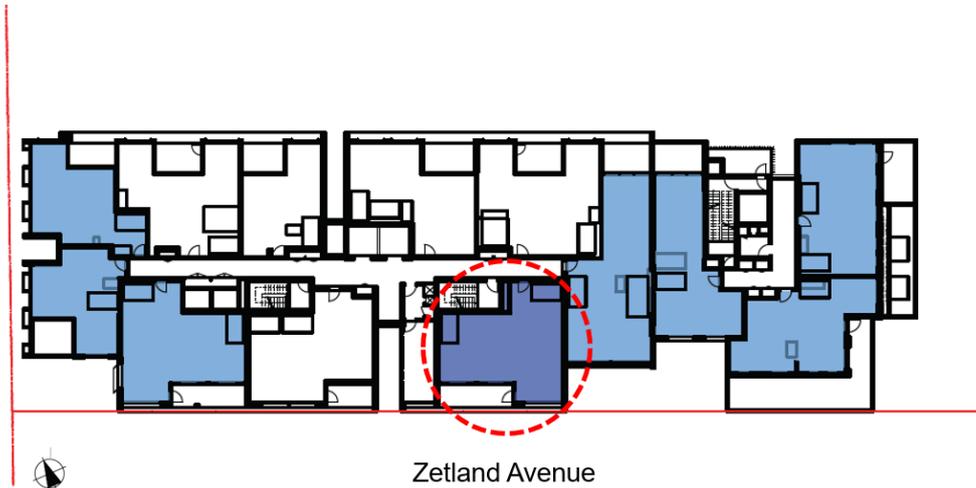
Cross ventilation diagram for a typical floor in Building A. Apartment crossflow highlighted by red dashed circle does not achieve ADG natural cross ventilation requirements.
